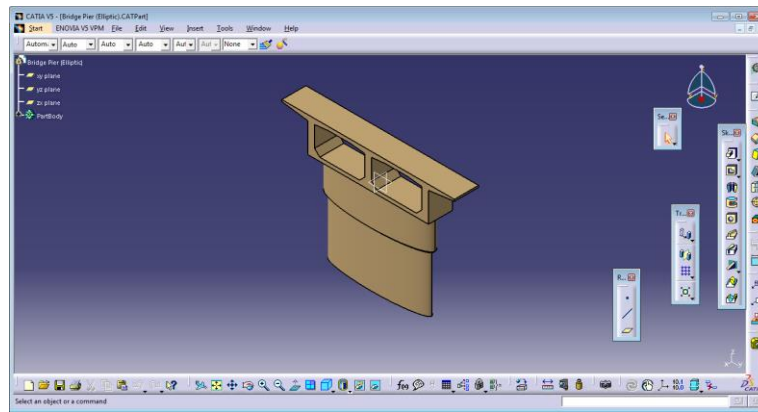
Model arrangement of Bridge Piers in CATIA-V5
